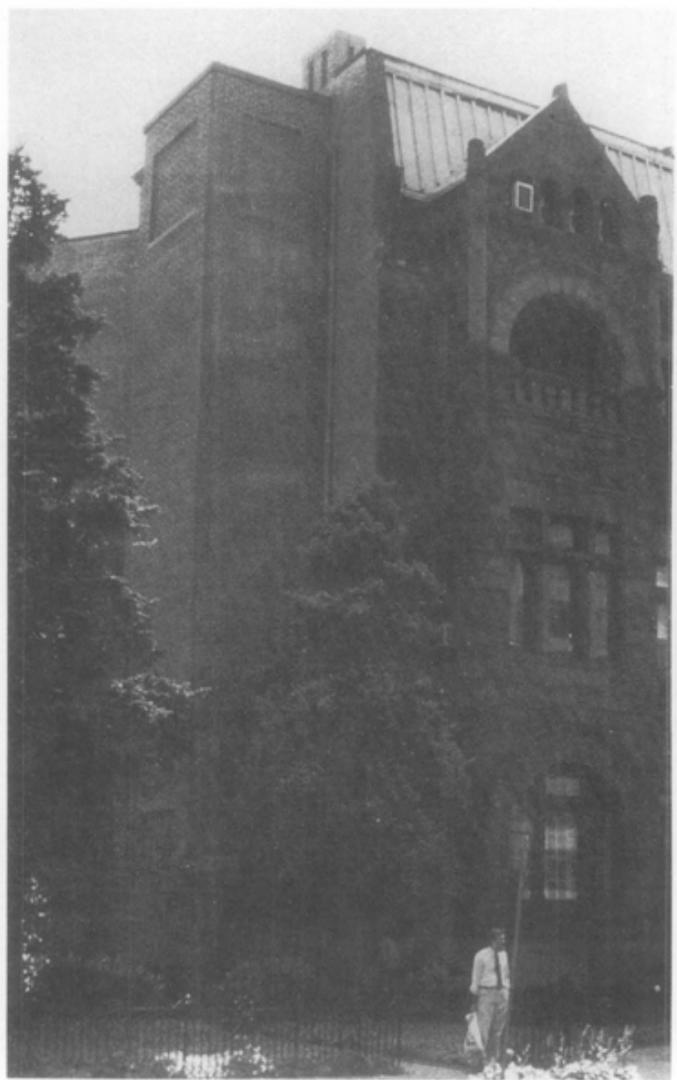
Creating an accessible entrance with a new elevator tower requires a compatible design. This elevator addition blends in with the historic building's materials and provides access to all public levels. Photo: Sharon Park.
